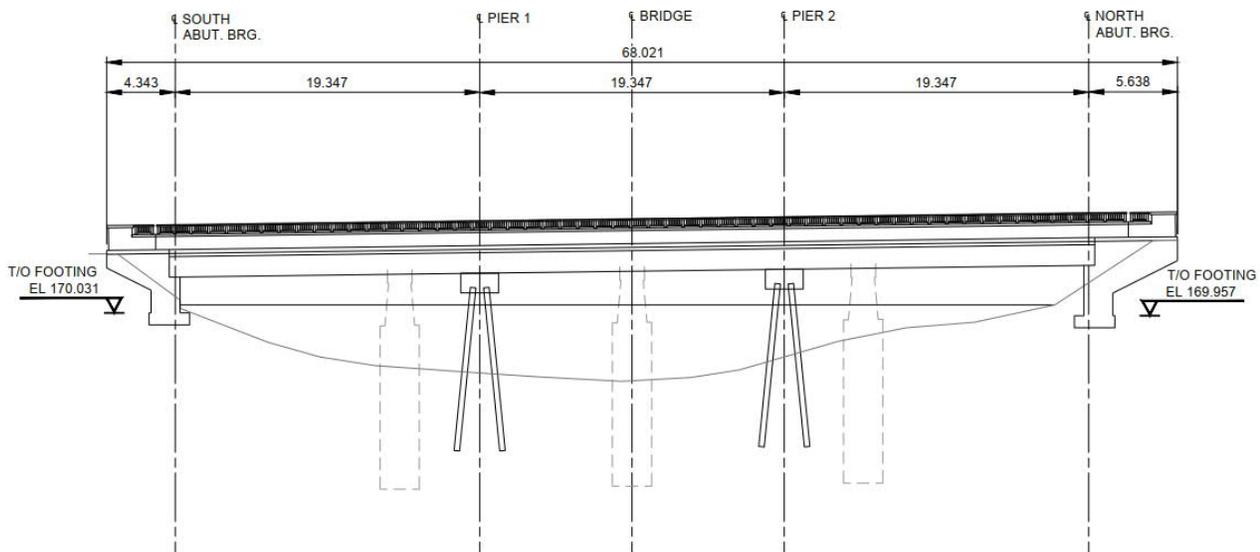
Proposed Elevation for Alternative Design Concept 3
